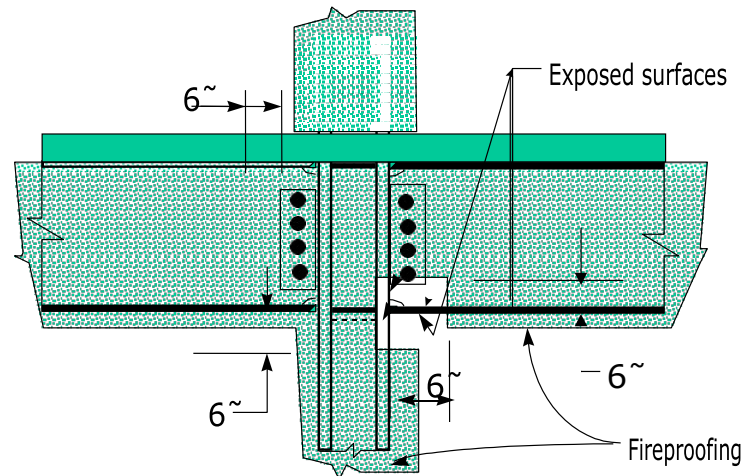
Fireproofing Removal for Initial Connection Inspection
